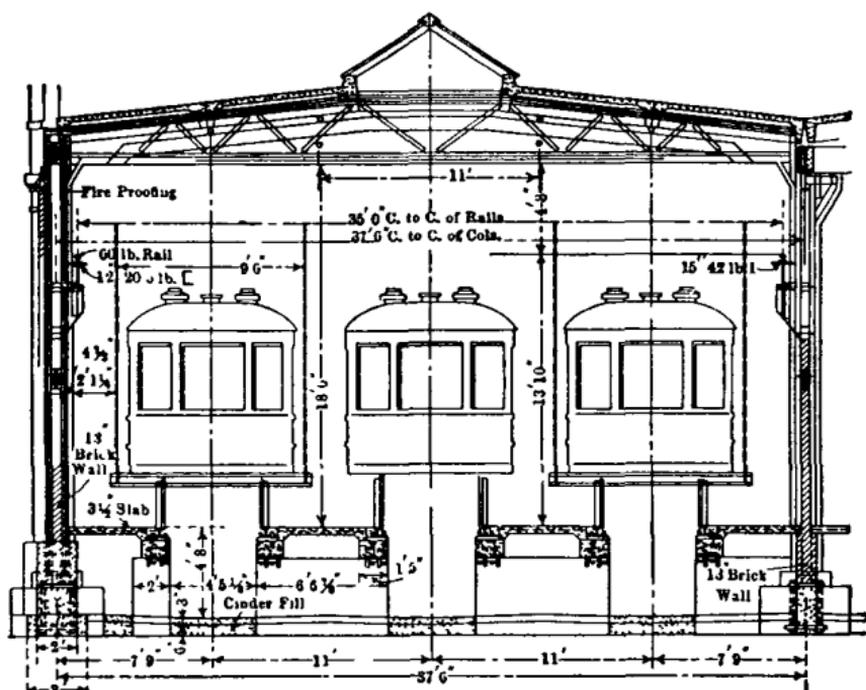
Luzerne car house, Philadelphia. Cross-section of bay for light repairs.
